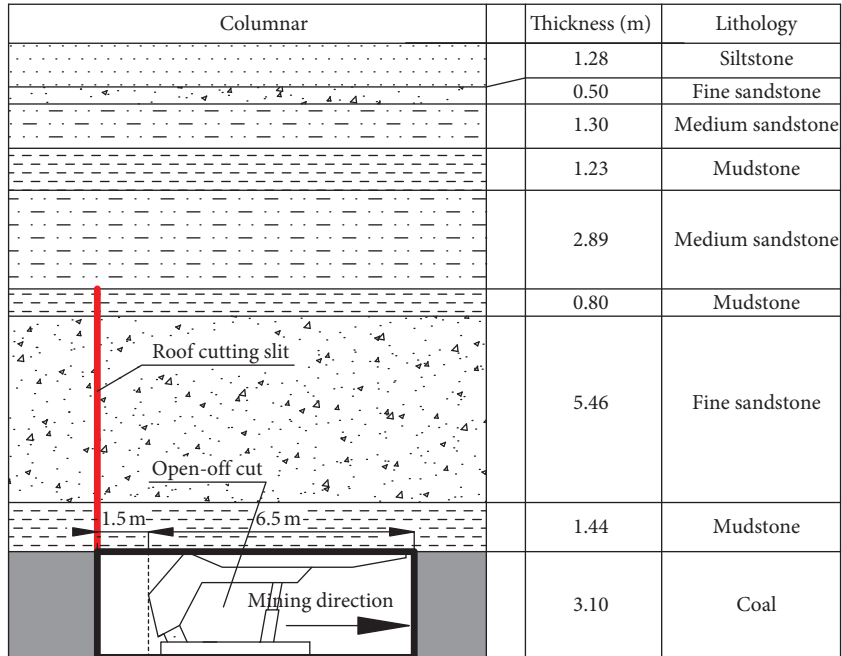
Open-off cut roof cutting design of 8304 working face.
